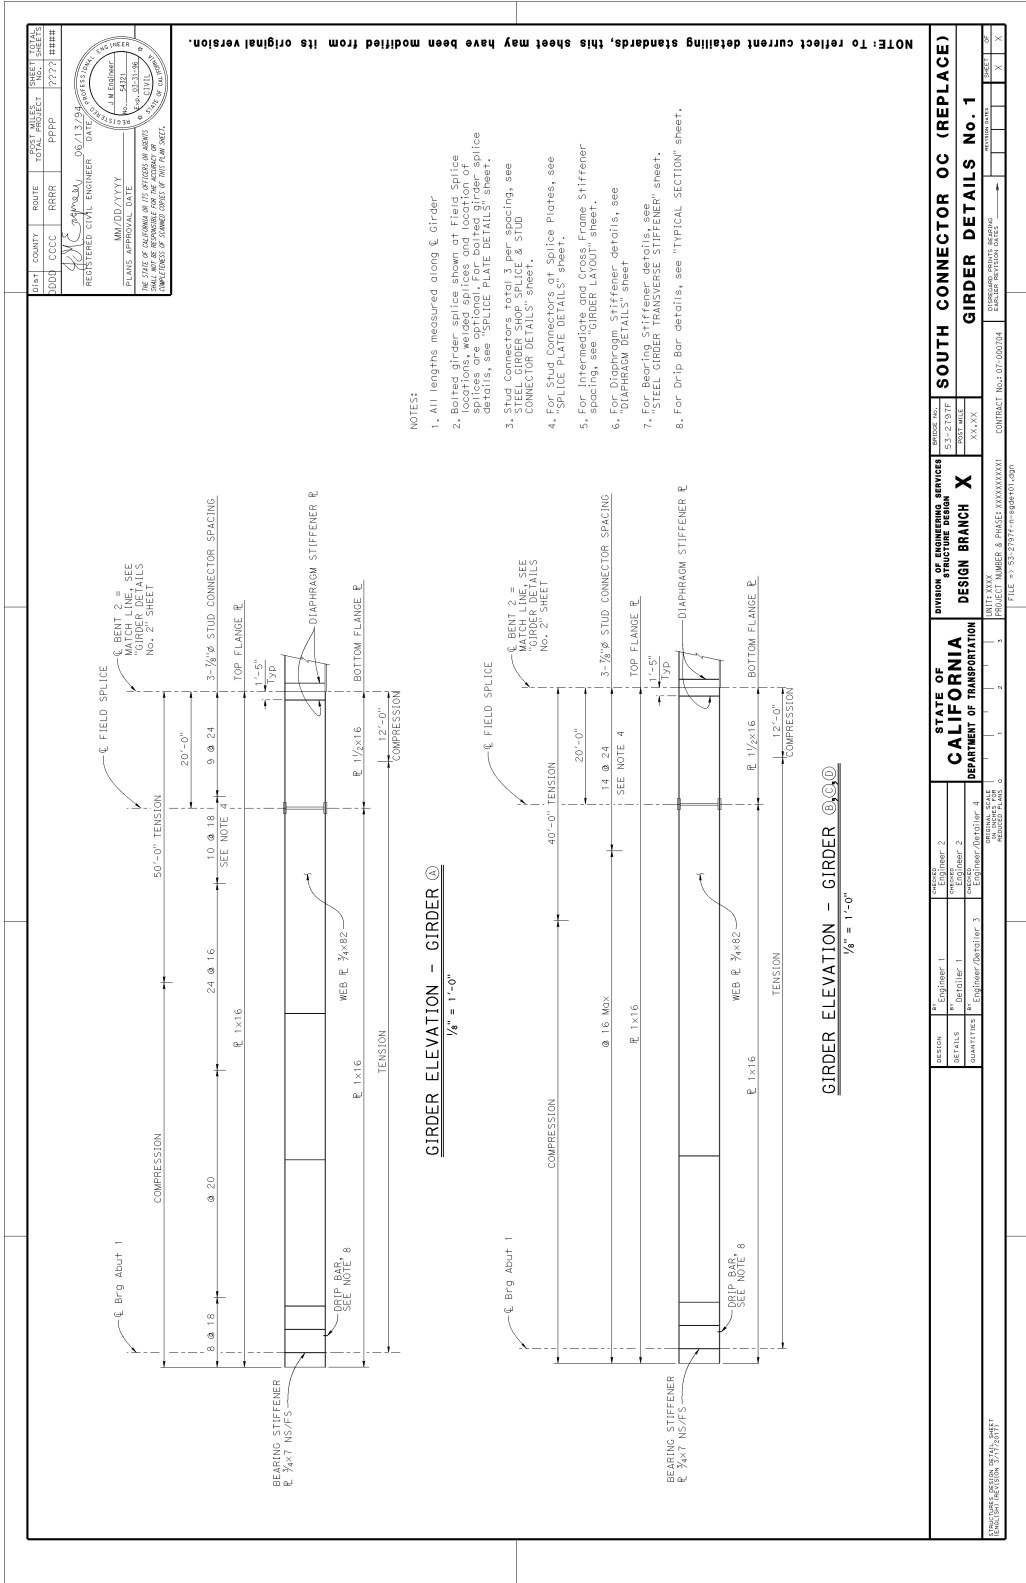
A.A.7 Steel Girder Bridge Detailing Example 7
